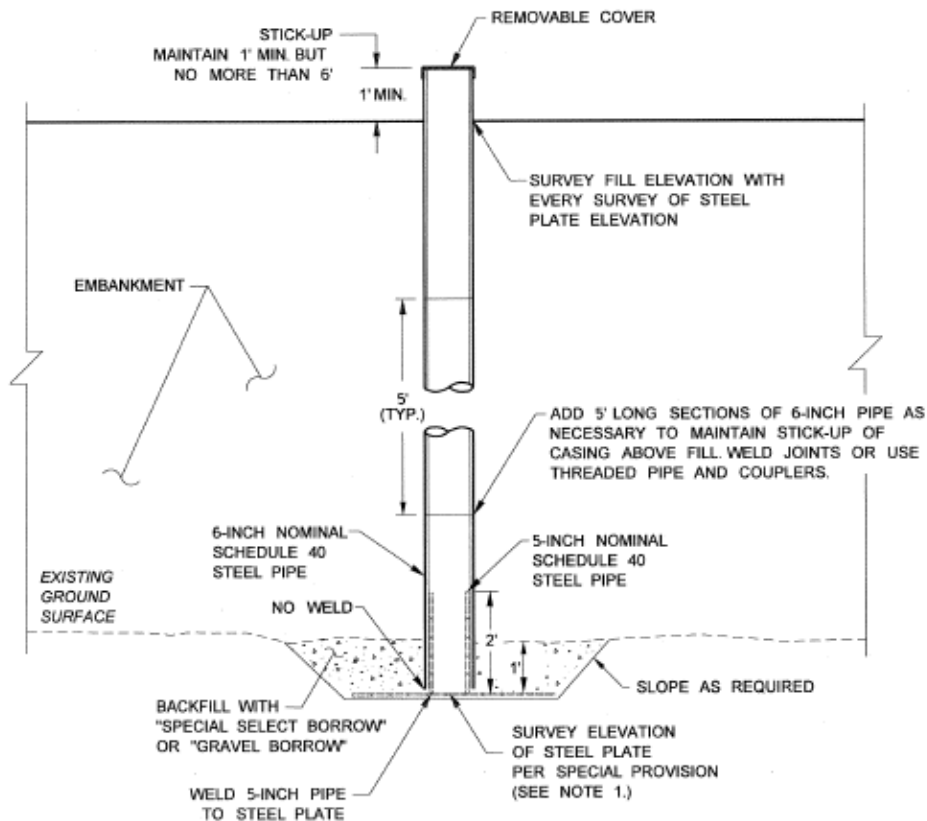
Installation Details for Settlement Plates at Site No's 7 and 8.
